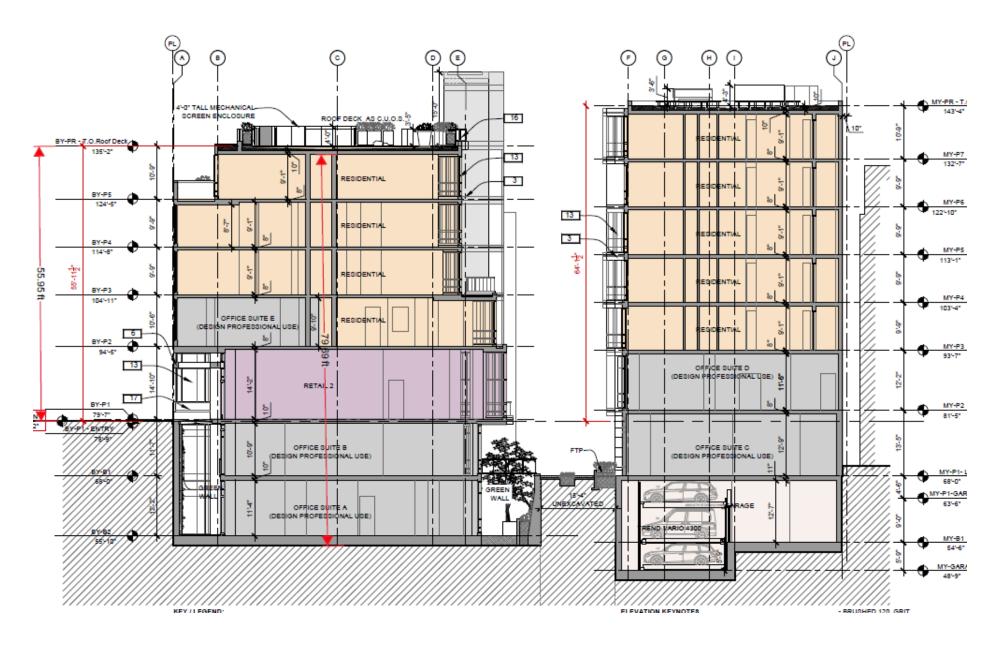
Section showing extent of proposed office space (gray shading), excerpted from project sponsor's plans
